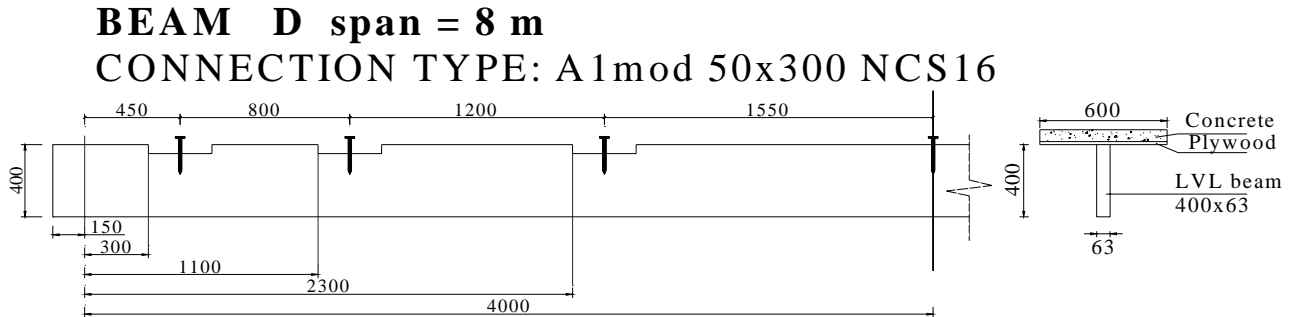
A typical 8 m TCC T-strip beam with a 300 mm length rectangular notched connection
